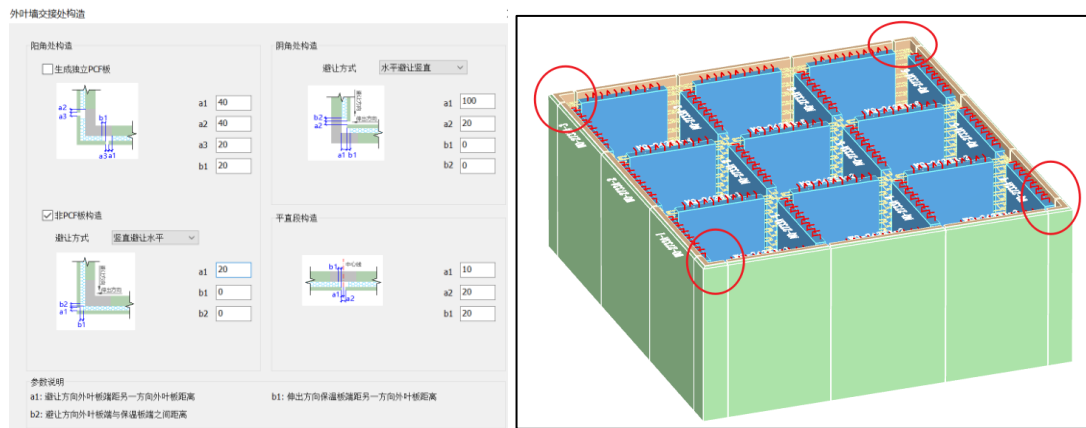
Wall horizontal connection node design in YJK's built-in prefabricated building design software
